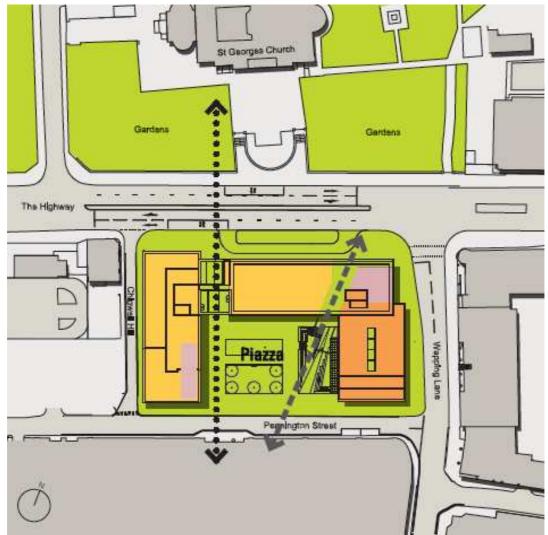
Site layout with pedestrian thoroughfare (dashed line) and visual link (dotted line) between St Georges Church and Tobacco Dock indicated
